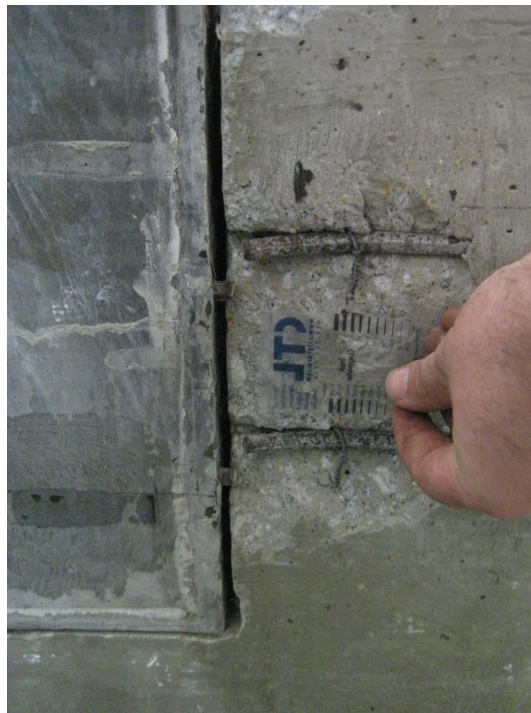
Spalling of HPC over rebar locations in specimen U-H-S-2-B.
